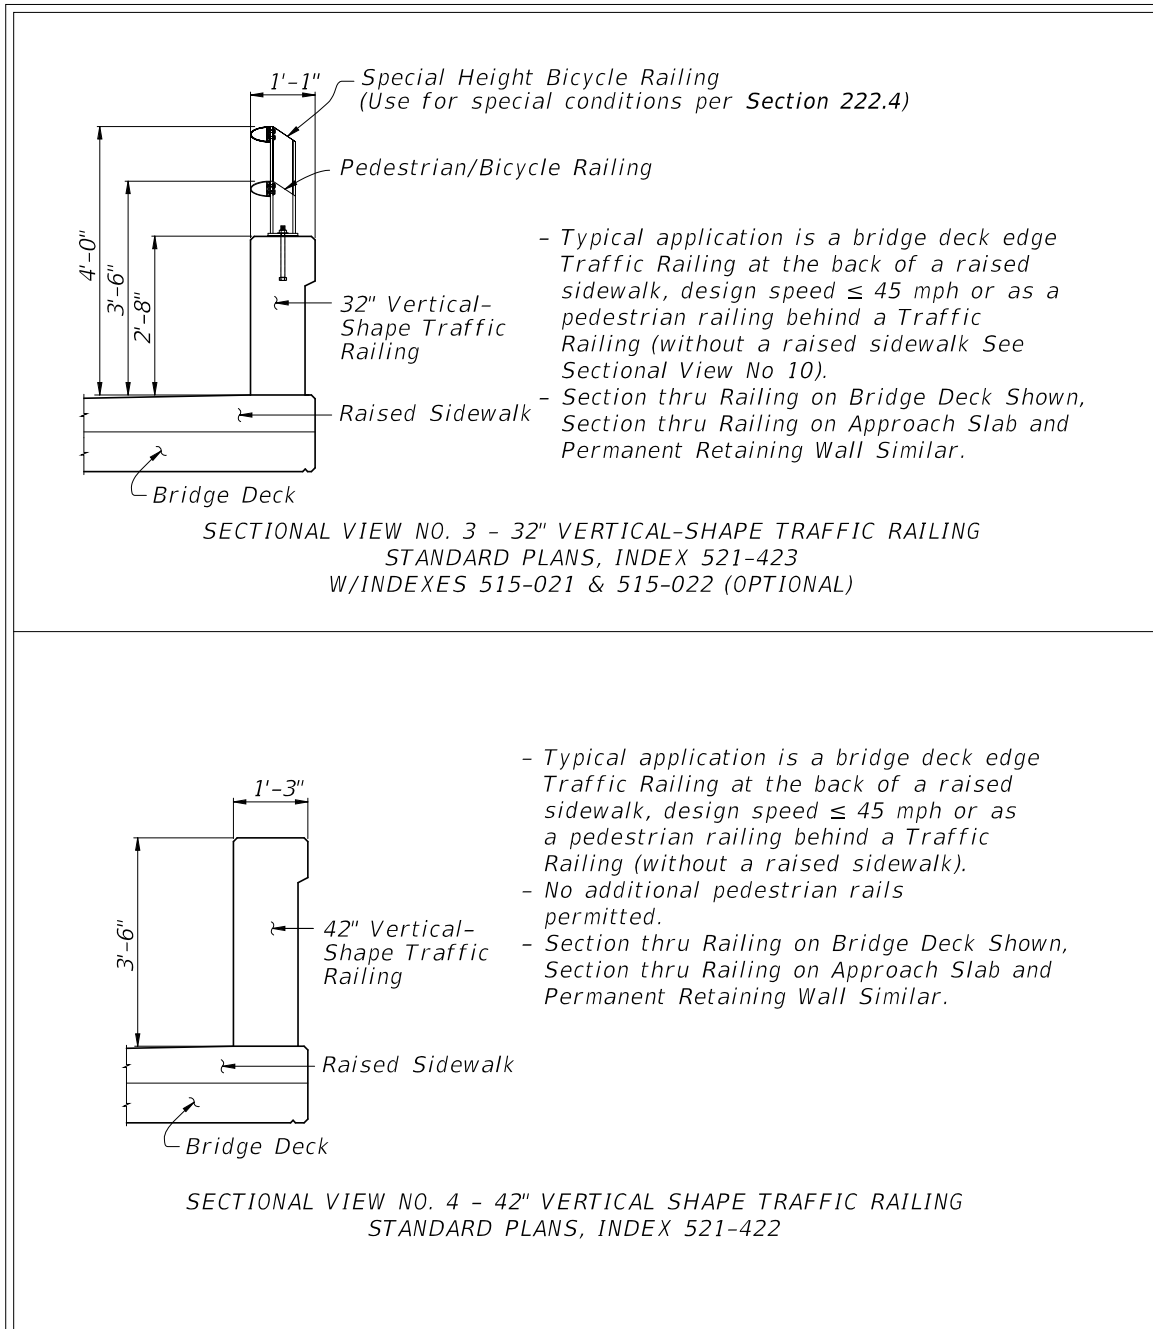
Bridge Traffic Railings – Other Shapes
